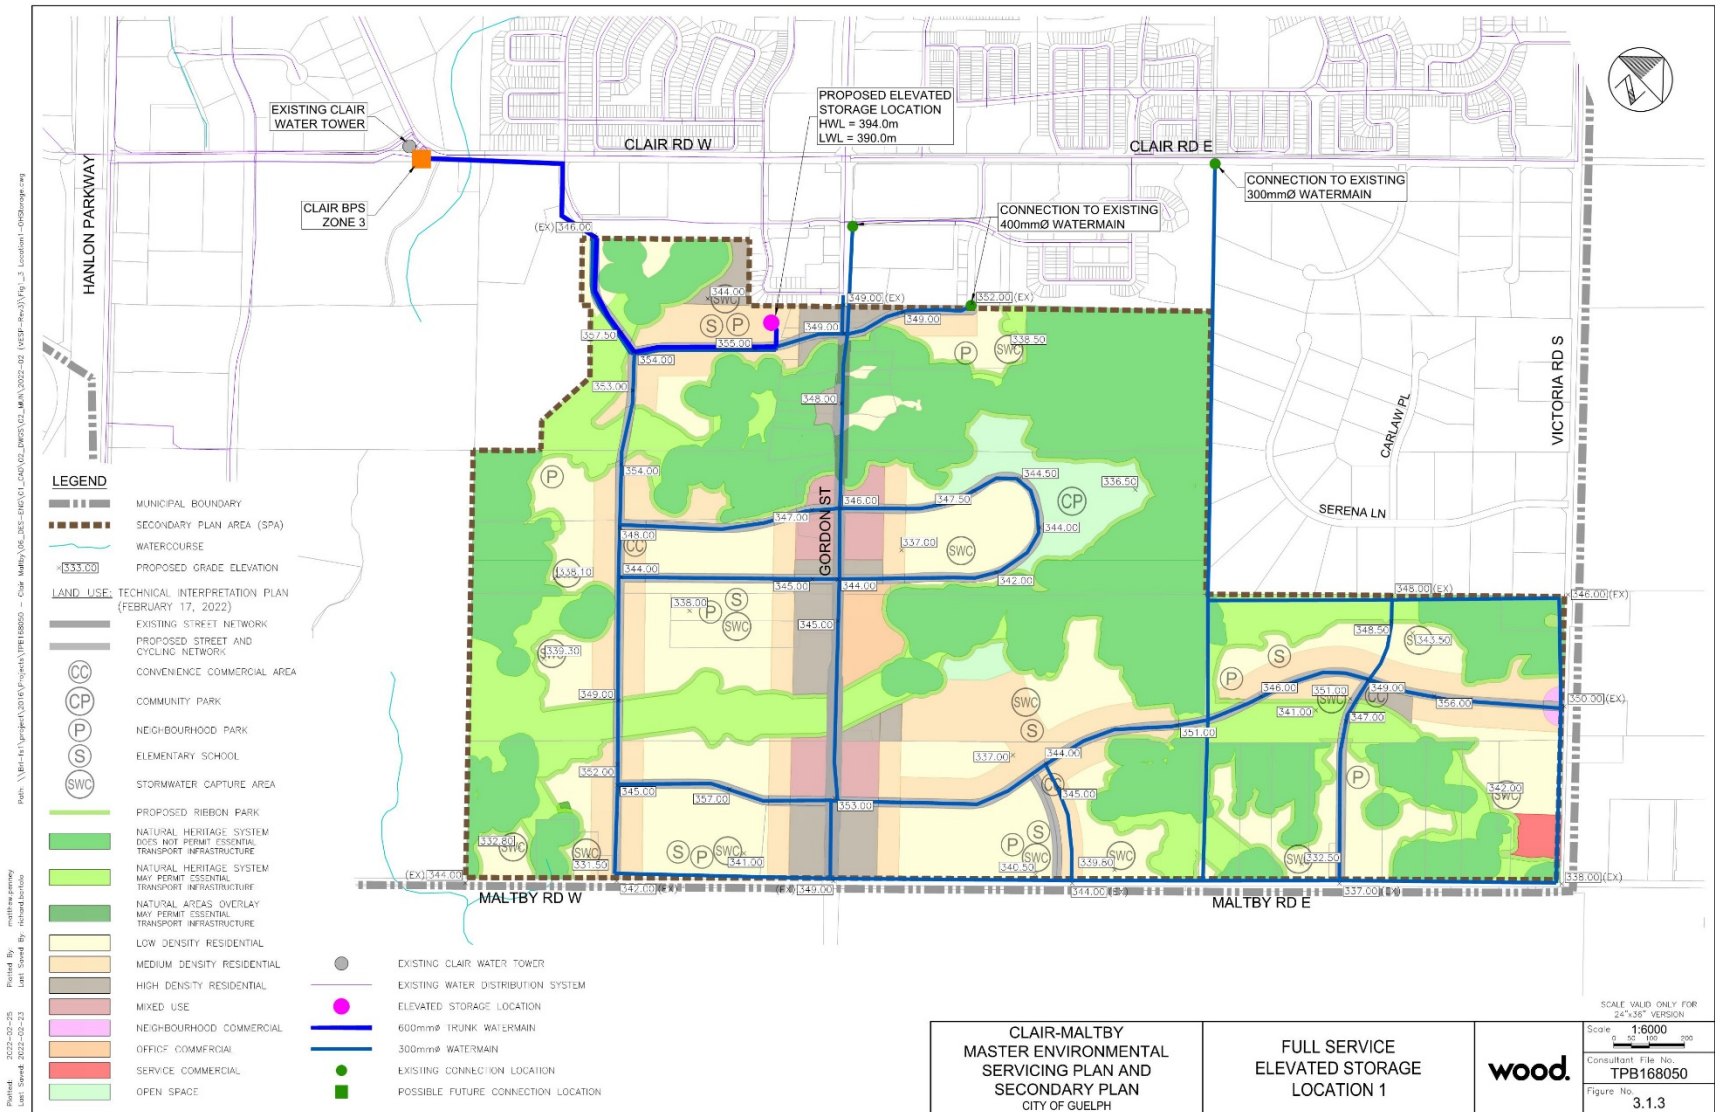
shows the location of the Elevated Storage within the northwest portion of the CMSP lands. This location is closest to the Clair Booster Pump Station, as well as the Zone 1 Clair Rd elevated storage tank and therefore, will require the shortest length of the transmission main from the Clair Booster Pump Station to the Elevated Reservoir. Its proposed location is close to existing and proposed residences and proposed schools. As such, the visual appearance and acceptability may pose an issue.
